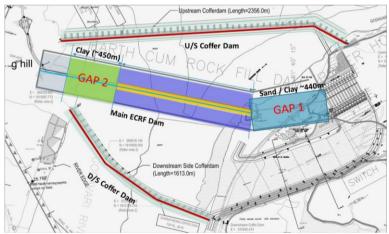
Plan of Deep Soil Mixing Works at GAP I and GAP II
